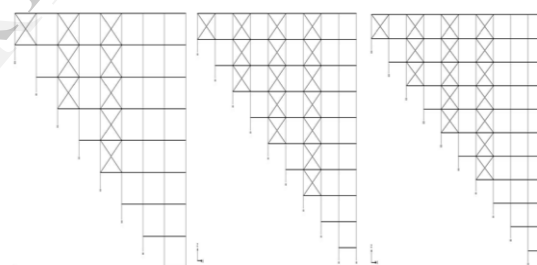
Step back frames of 8 storey, 9 storey and 10 storey buildings with bracings:
